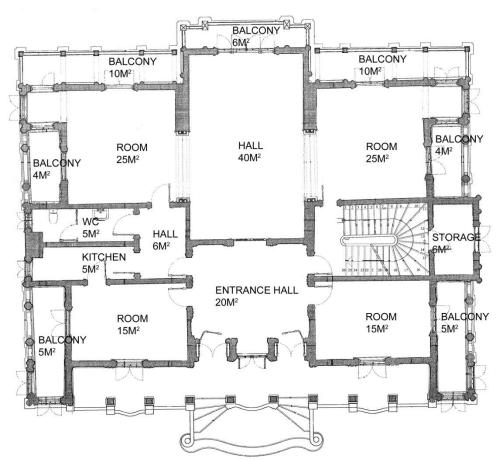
36 Con Pasha Mansion, Ground Floor.
